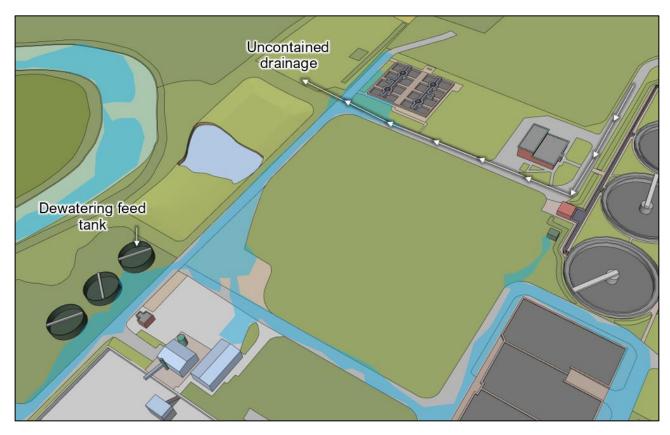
Potential spill pathway to River Don via un-contained surface drainage north of the site.
